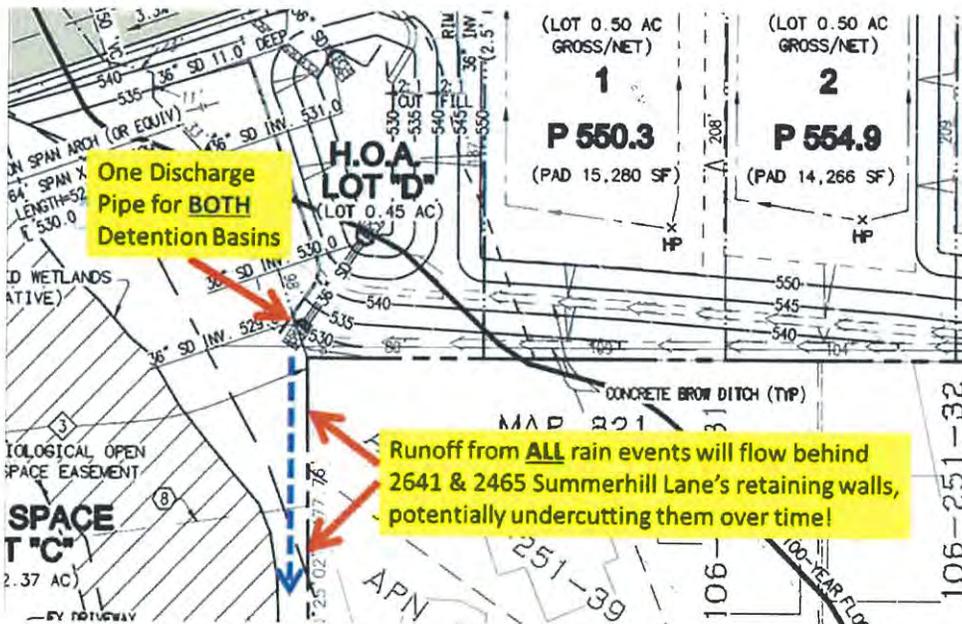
Reference (d) extract depicting placement of the discharge pipe pointing all water from the two detention basins along two retaining walls located at 2461 and 2645 Summerhill Ln.
